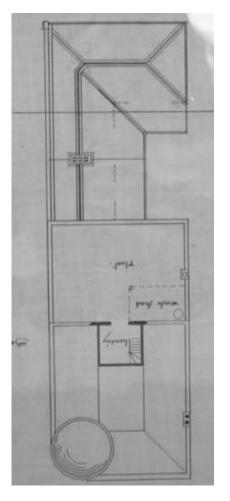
143–143a George Street, alterations undertaken in 1913, Roof Plan.
